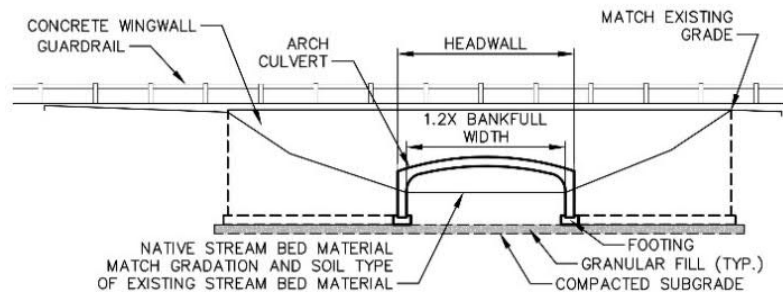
Typical detail of an open arch culvert designed to meet MA Stream Crossing Standards
